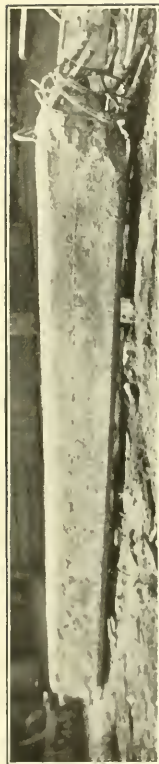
PILE WITH HEAD SMASHED, EXPOSING REINFORCEMENT.
